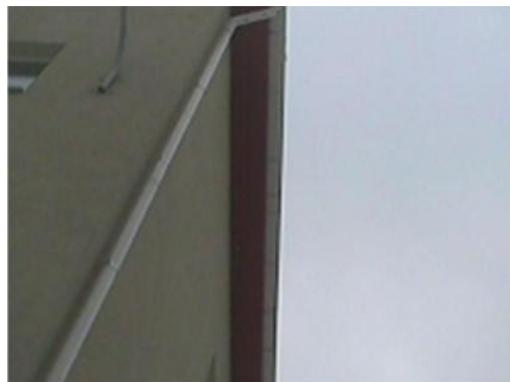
Eastern side of the facade of the building, renovated section
